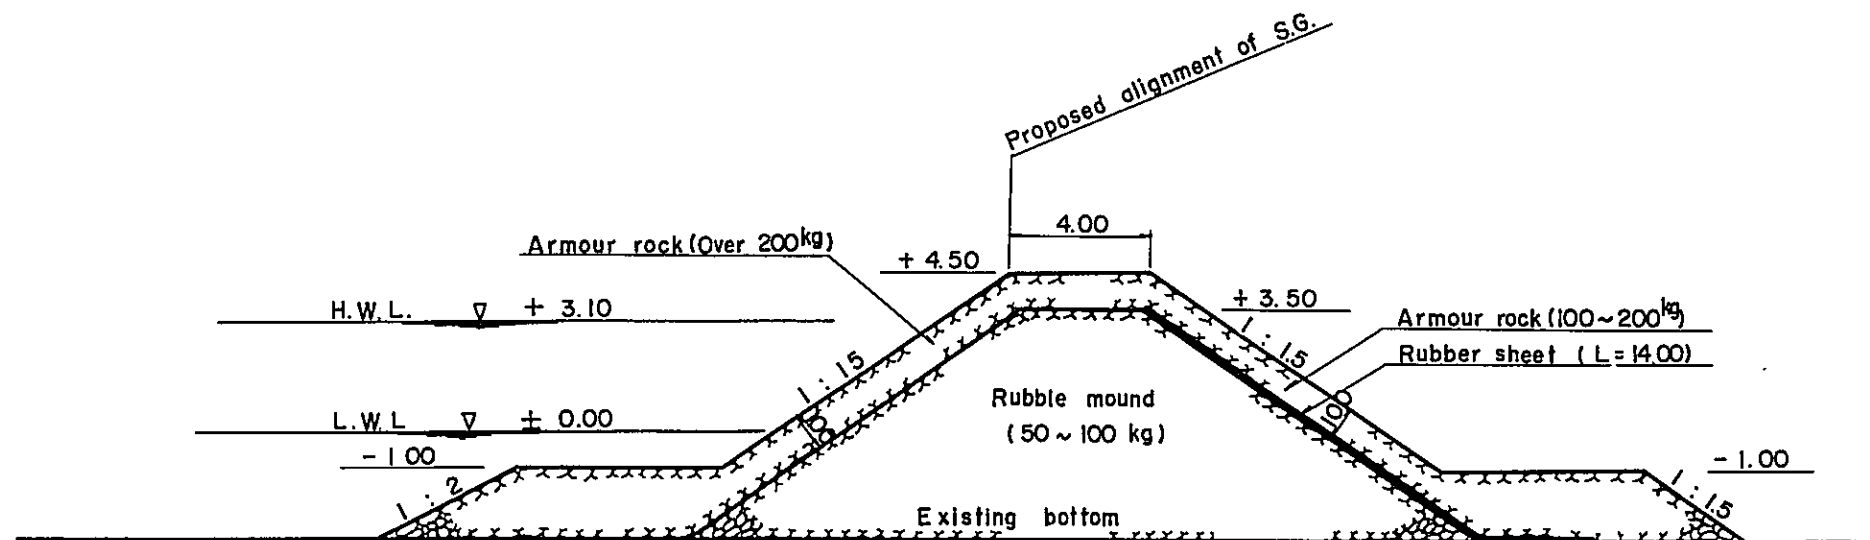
(e) STANDARD SECTION OF SOUTH SEA WALL
